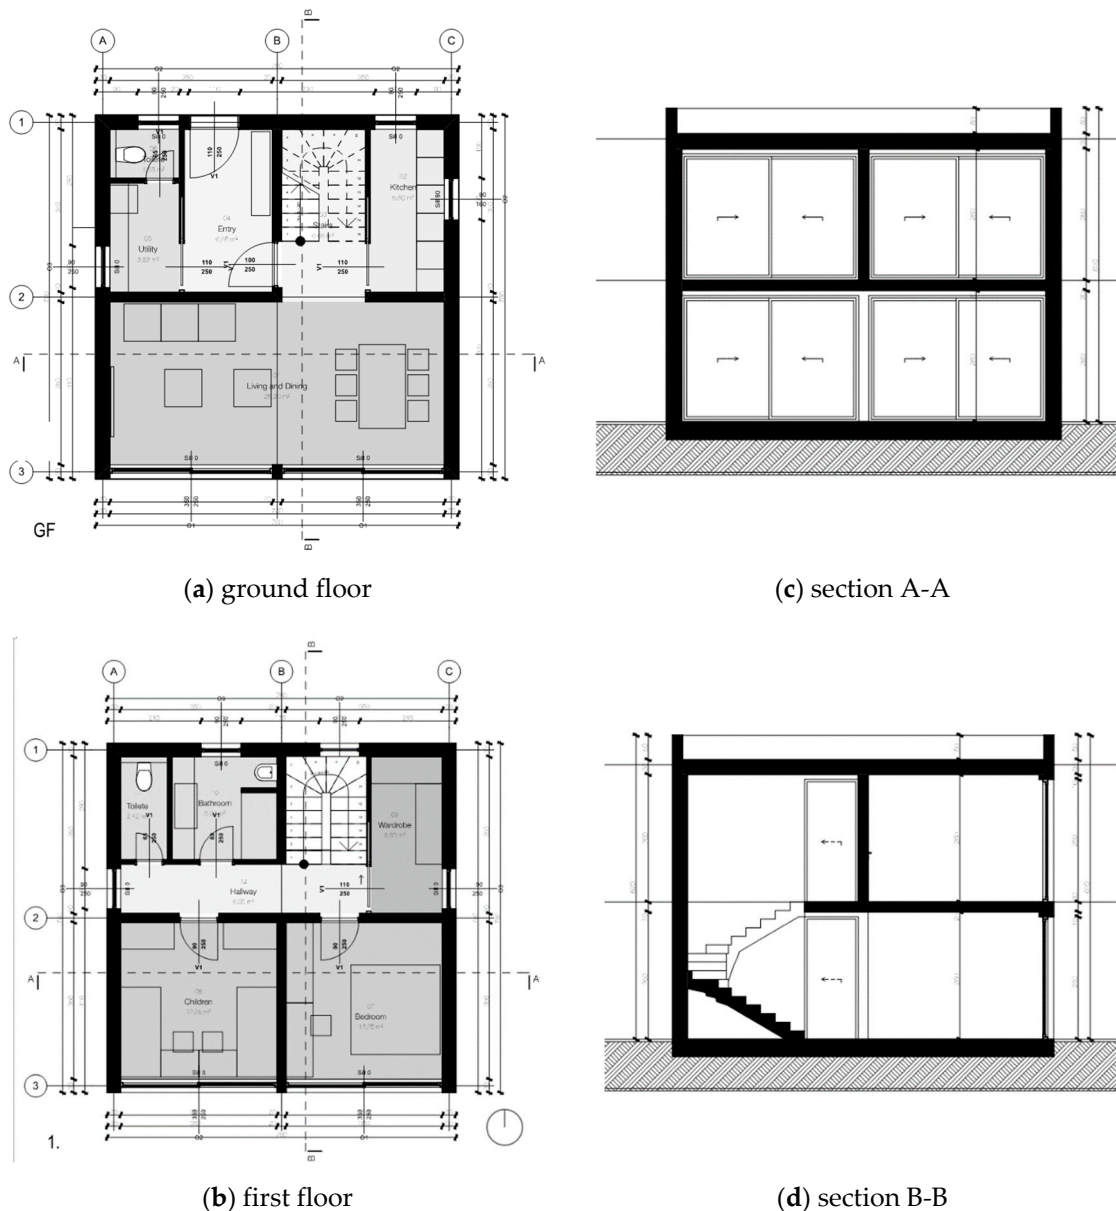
Case study building (a) ground floor, (b) first floor, (c) section A-A, and (d) section B-B.
